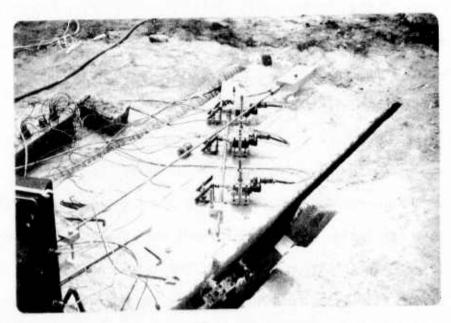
In-situ specimen, side view. DCDTs along joint on top and side surfaces and along axis of specimen.
